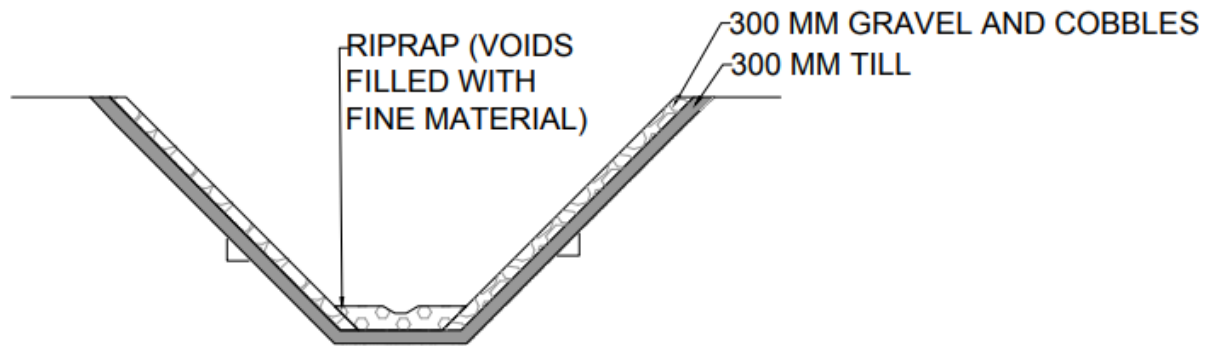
Design Type 2 - Check Weir Crest Cross Section
